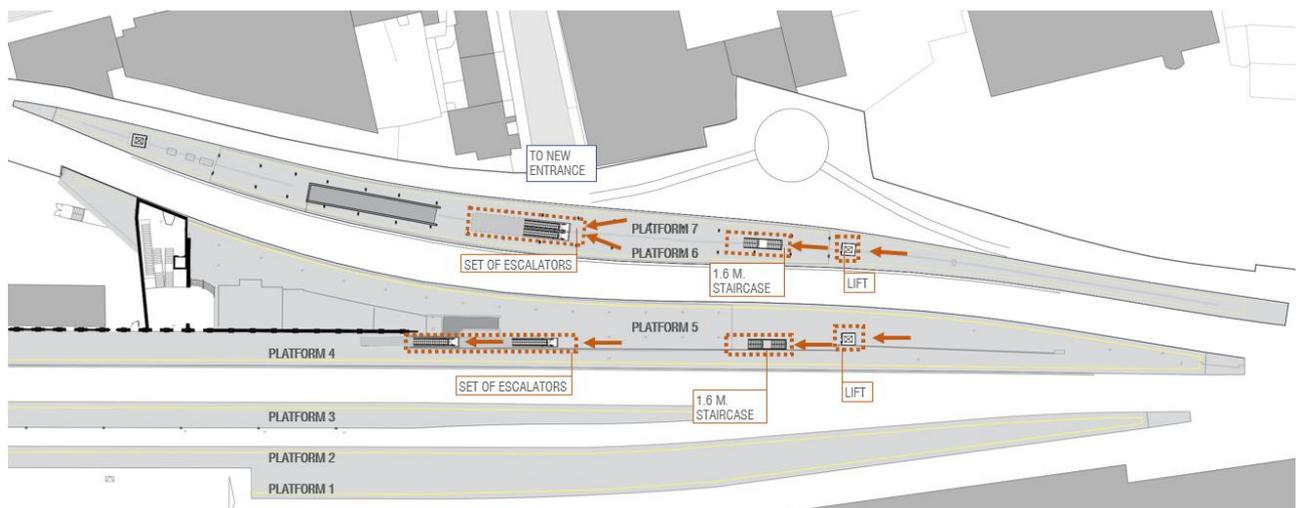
Platform facilities. Proposed additional means of access to the platforms
